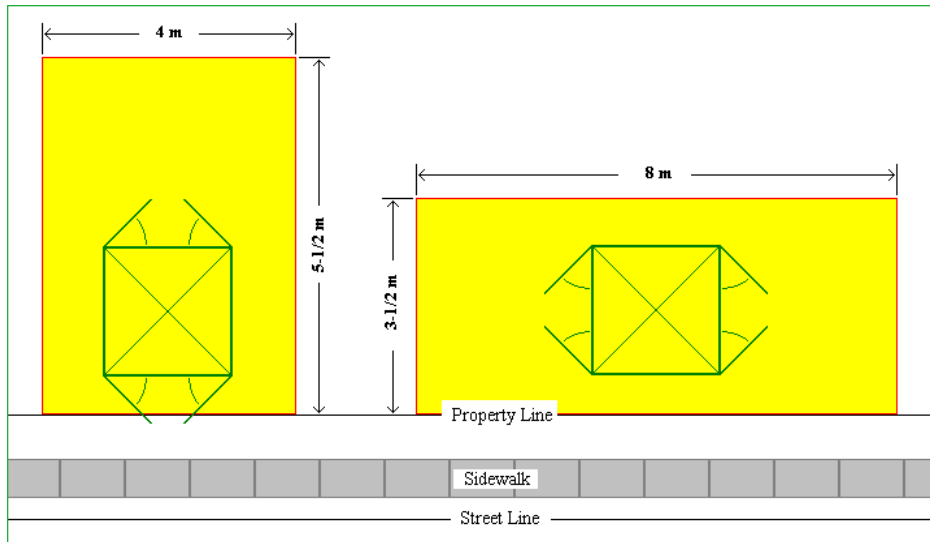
, Minimum Easement Dimensions for Padmounted Switching Enclosure
